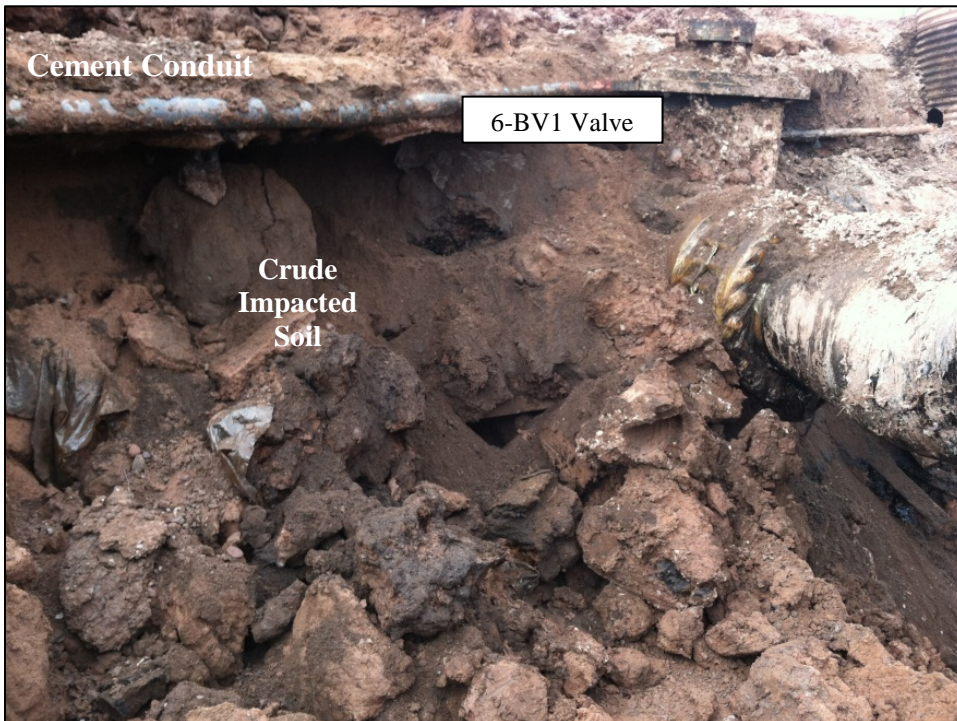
6-BV-1 valve and cement conduit with crude oil impacted soil.
